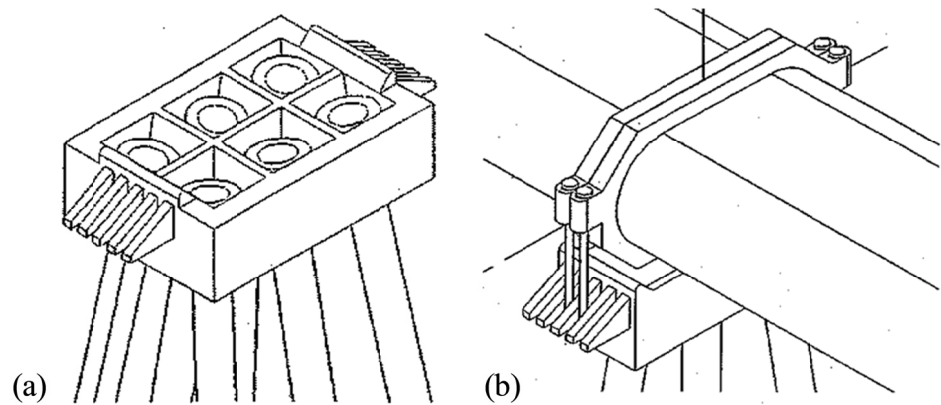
Details of the connection between the supporting groups of piles and the tunnel (Felch et al., 2001).
